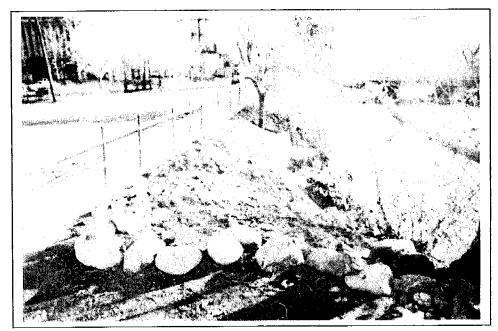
Section D. south bank at Island Avenue and Barbara Bennett Park, camera facing southwest, 10/26/01.
